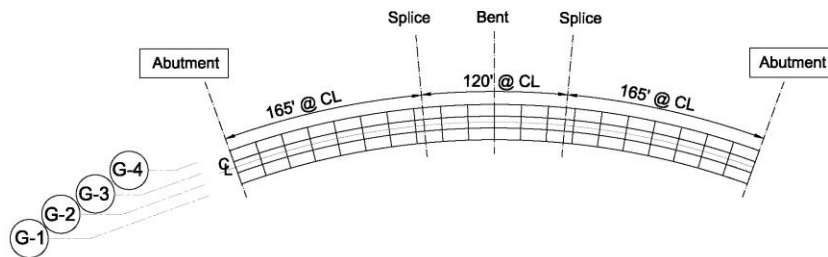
Simplified Framing Plan, Bridge C6: Two-Span, 4-Girder, 198.1 m Radius, R/L=28.9
